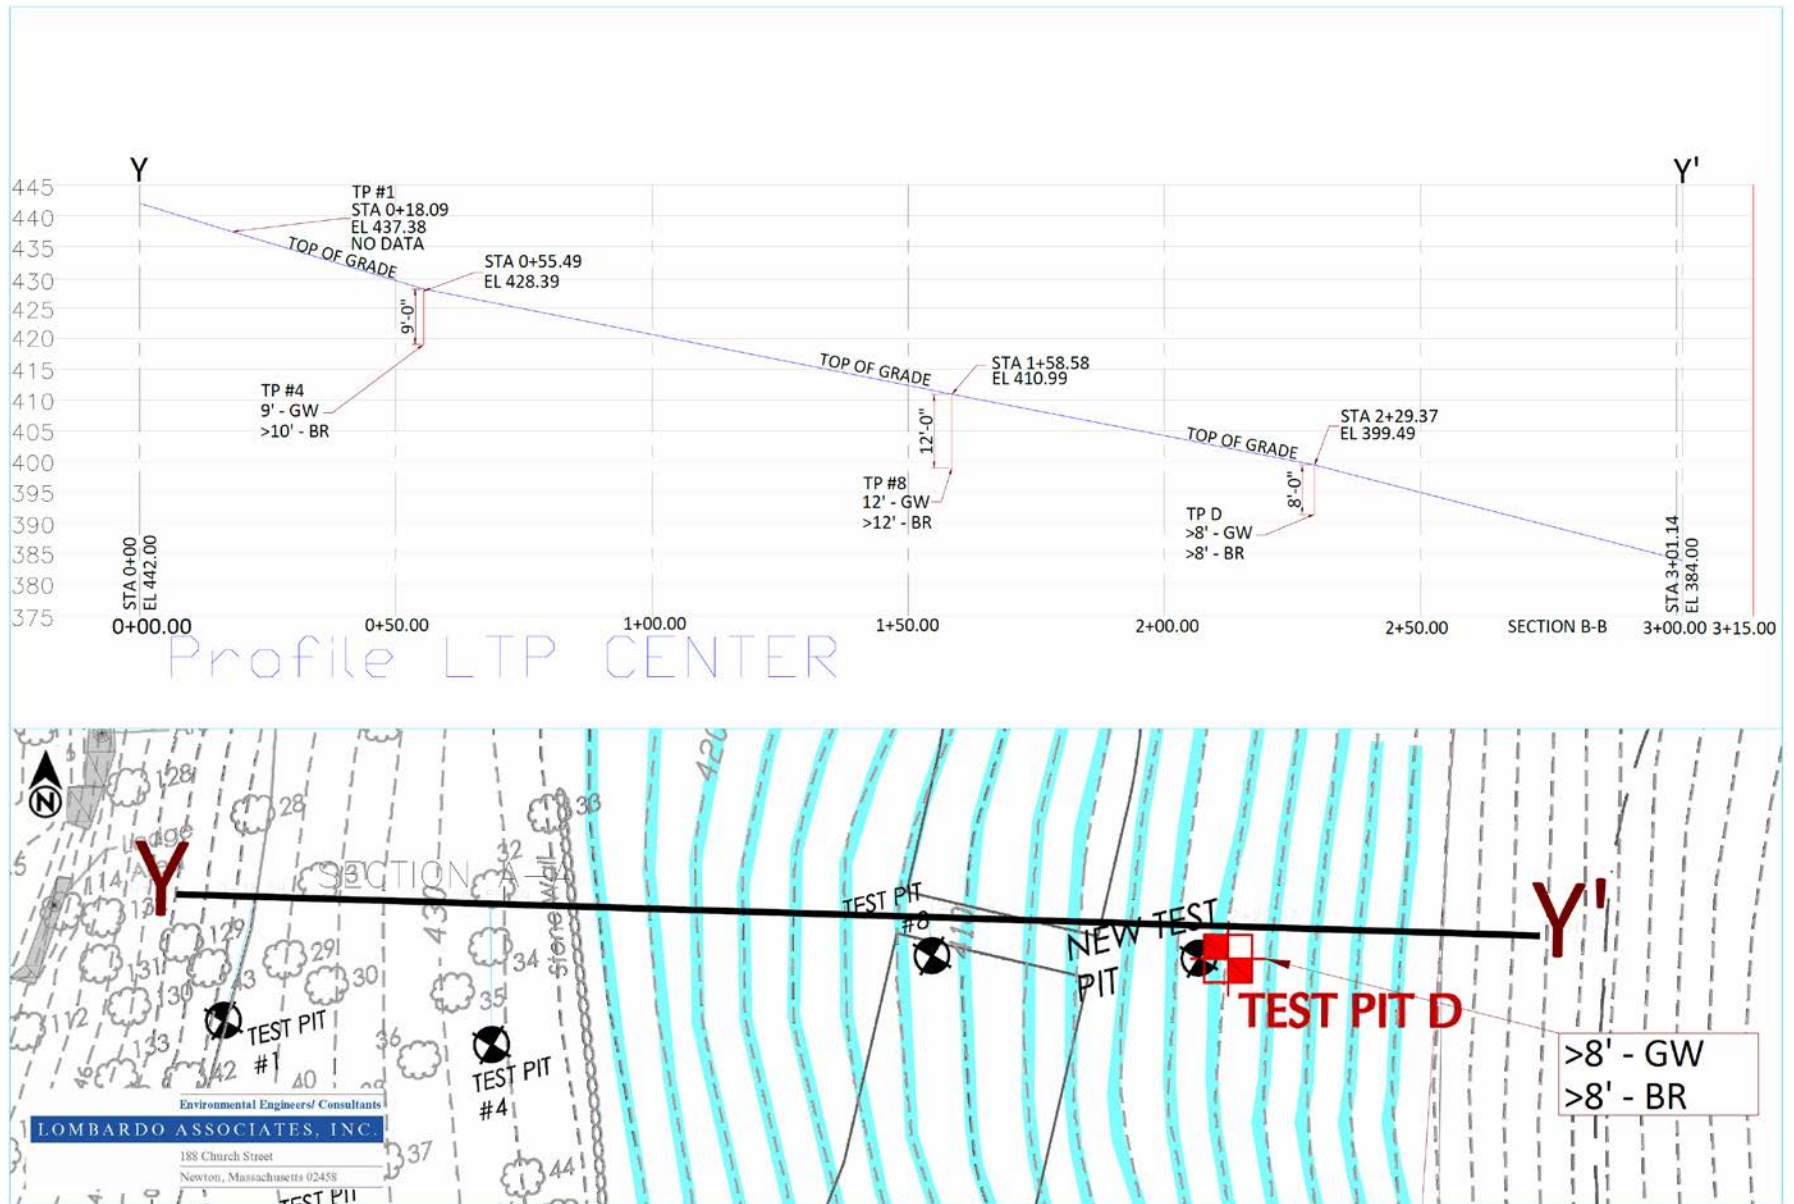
Lower Trinity Pass, Center Test Pits Cross-Section
